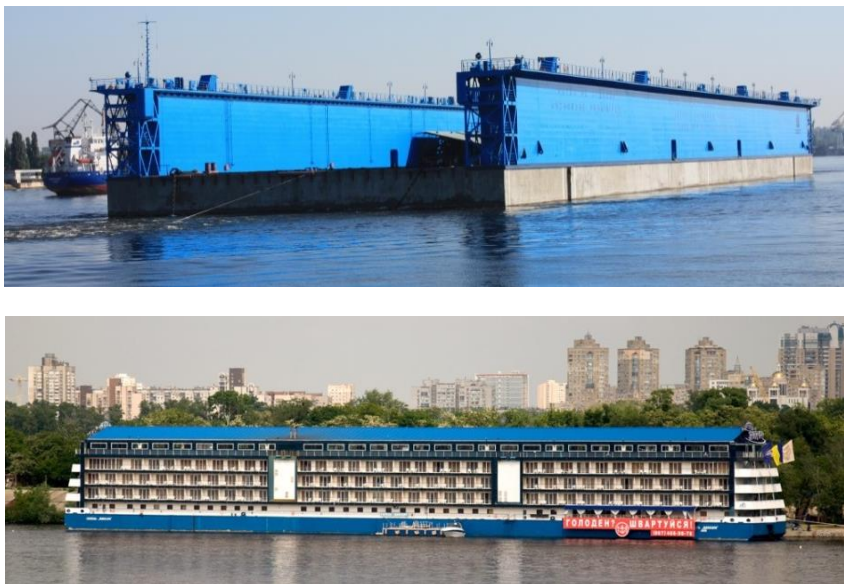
Floating dock and hotel with reinforced concrete pontoons. These structures were built at Kherson state plant "Palada".
